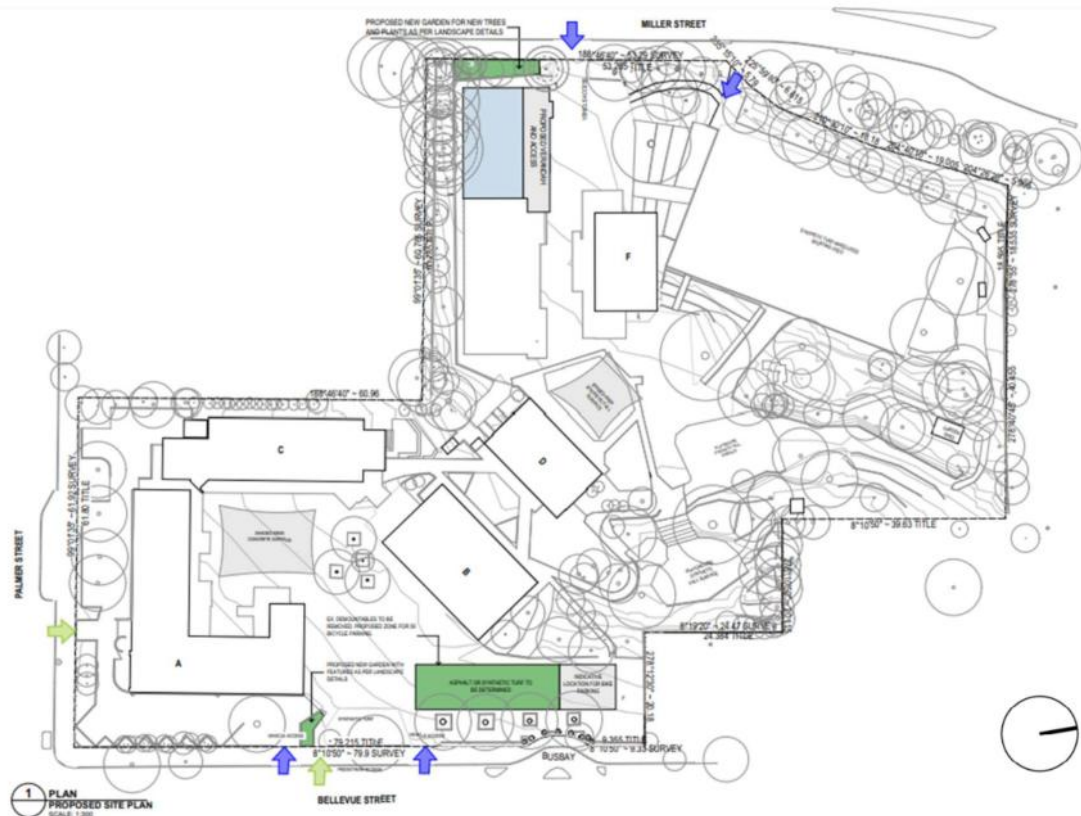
Proposed Scope of Works (Source: Fulton Trotter Architects, Proposed Site Plan (Rev 6))
